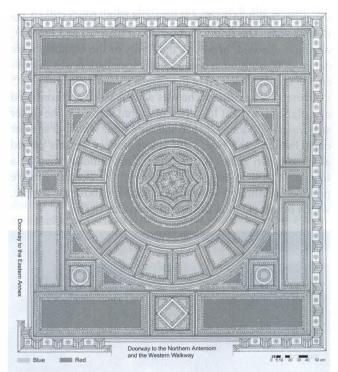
Reconstruction drawing of the ceiling (by U. Bellwald)
